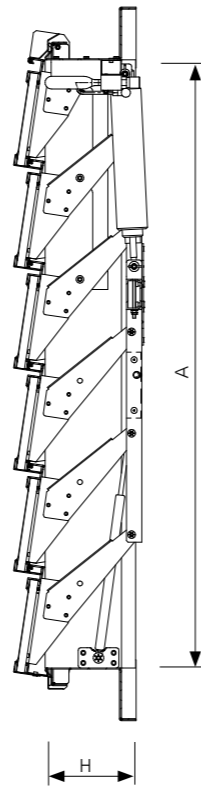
Section A-A of mcr LAM louvered vent in closed position (façade installation)
